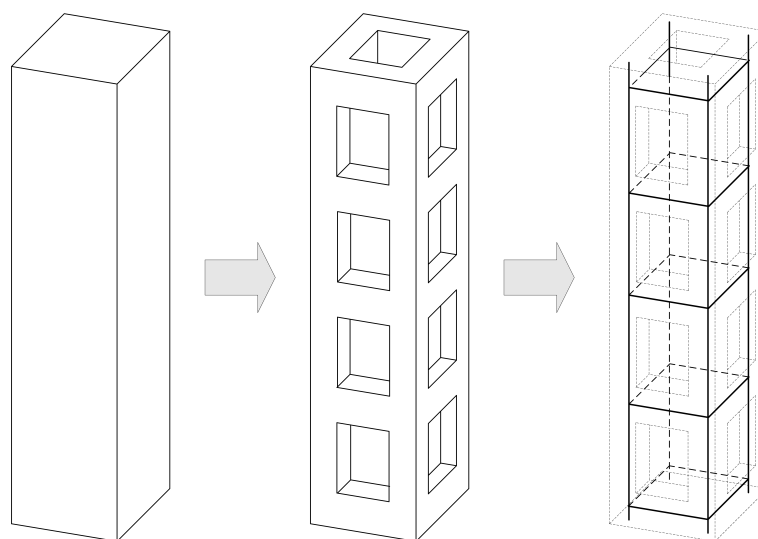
A skyscraper with footprint shape A will become a compound structure
